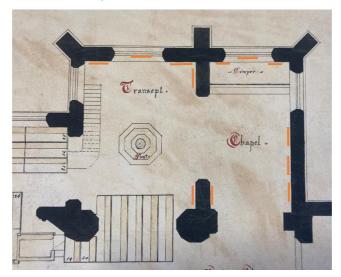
Extract from plan of 1852 showing North Transept and Cowper Chapel. Locations of wall monuments added in orange.
